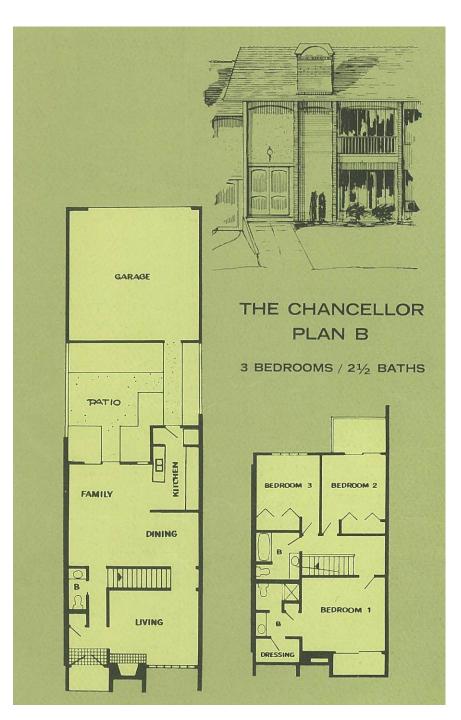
The largest of the three floor plan types in the Oak Hills Townhouses.
